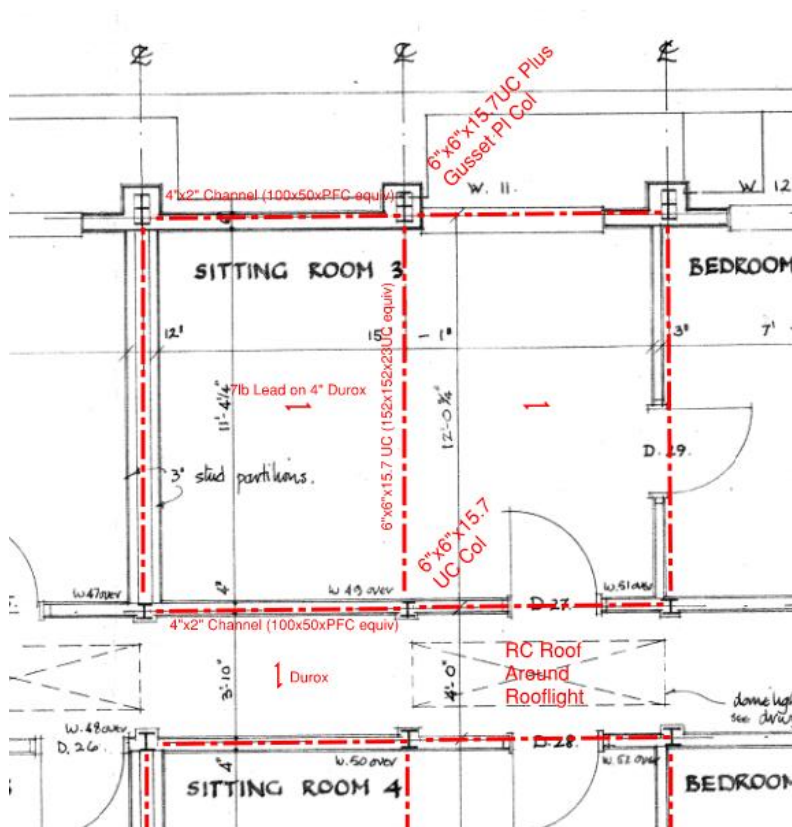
Extract of Original Architect's Plan with Structure Overmarked
